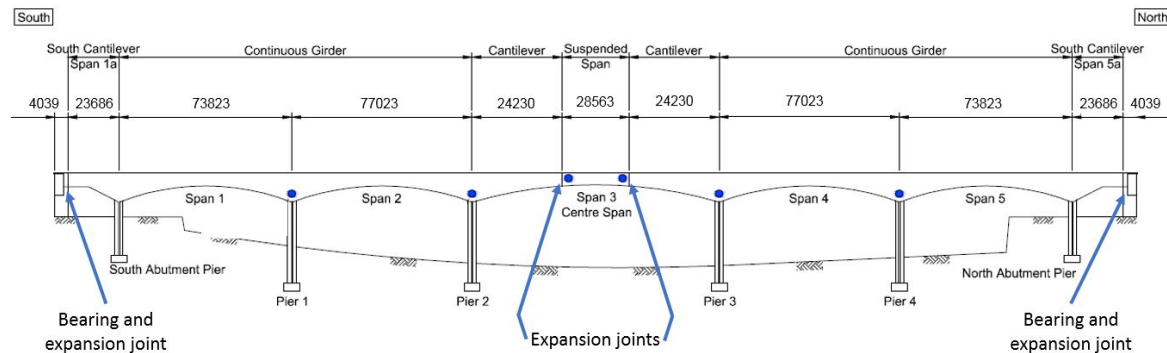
Elevation of Waterloo Bridge, London. ATS prism and corner reflector locations are marked as red dots.
